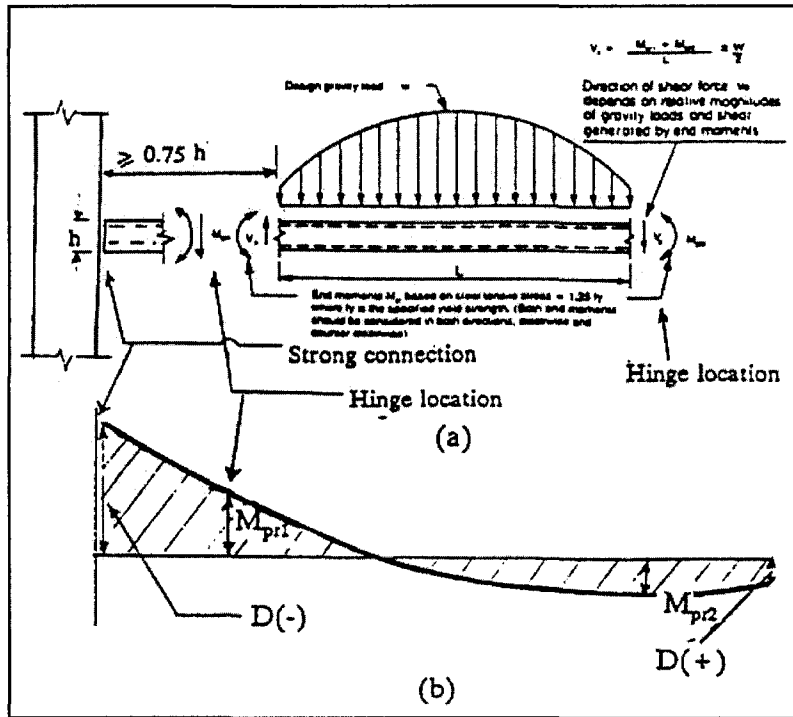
Design forces for strong connections between beams and continuous columns.
